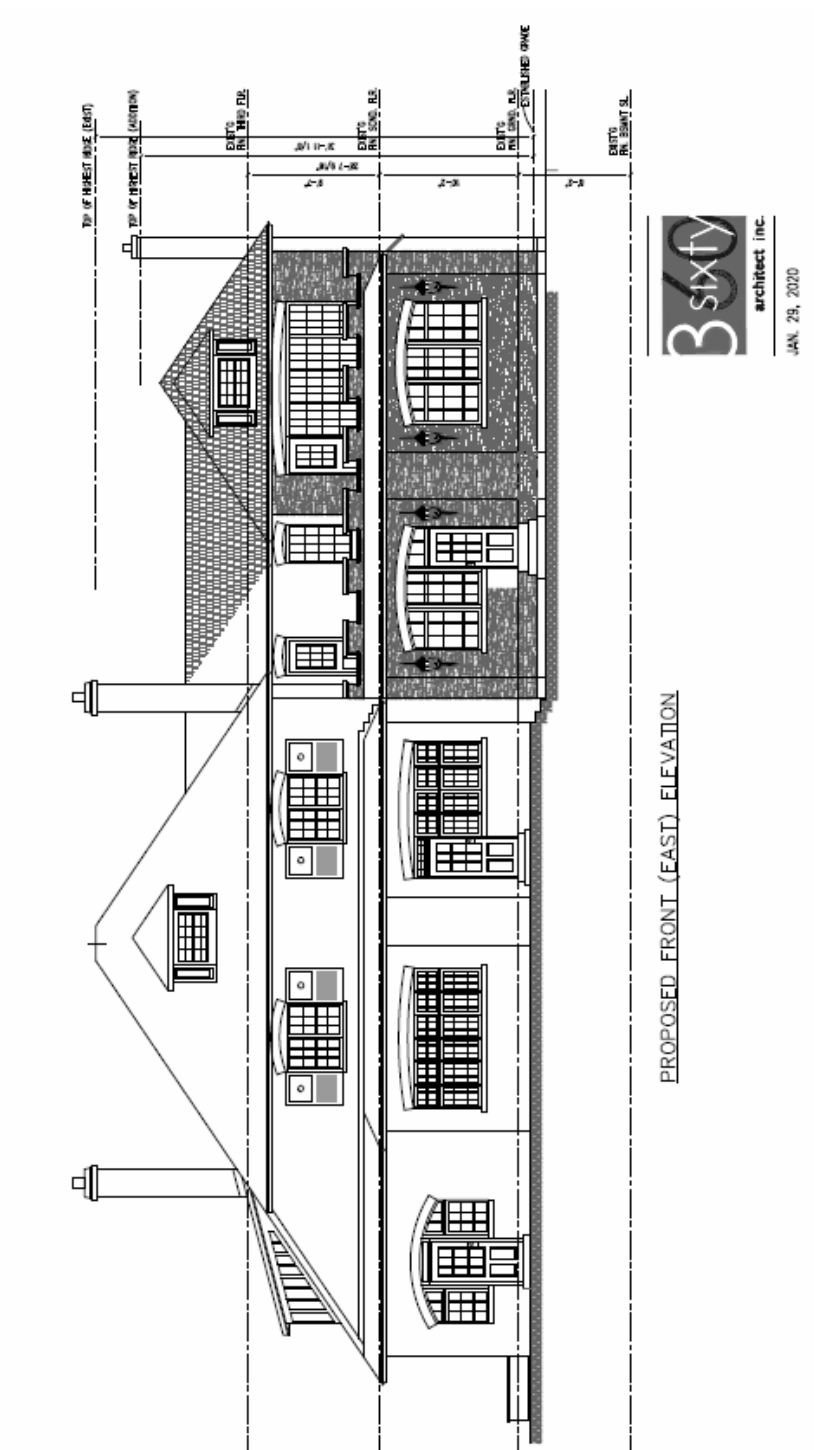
The front or east elevation of 1341 Stavebank Road with proposed addition.
